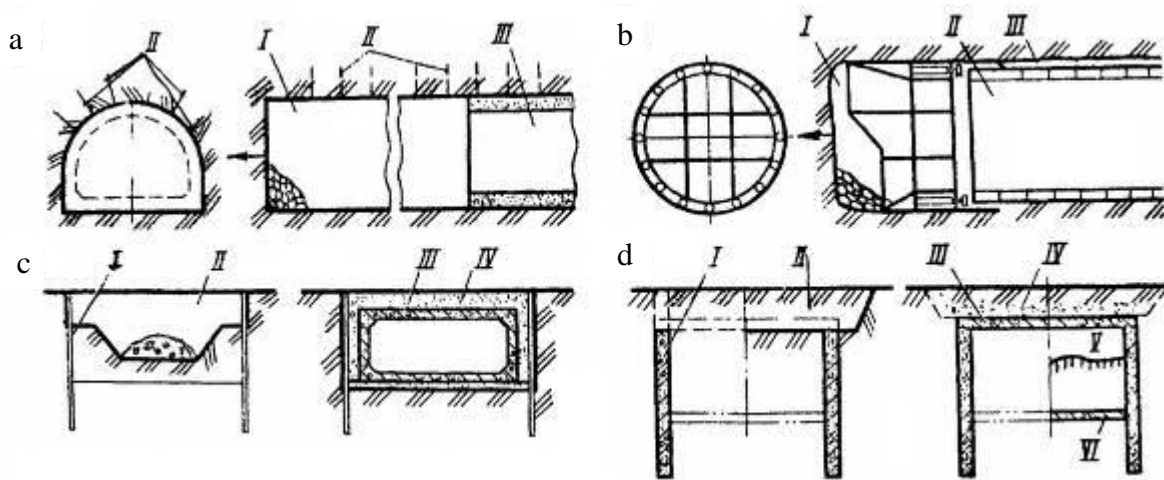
Construction schemes of tunnels I, II, III, IV, V, VI: sequence of construction works and construction of tunnel structures
